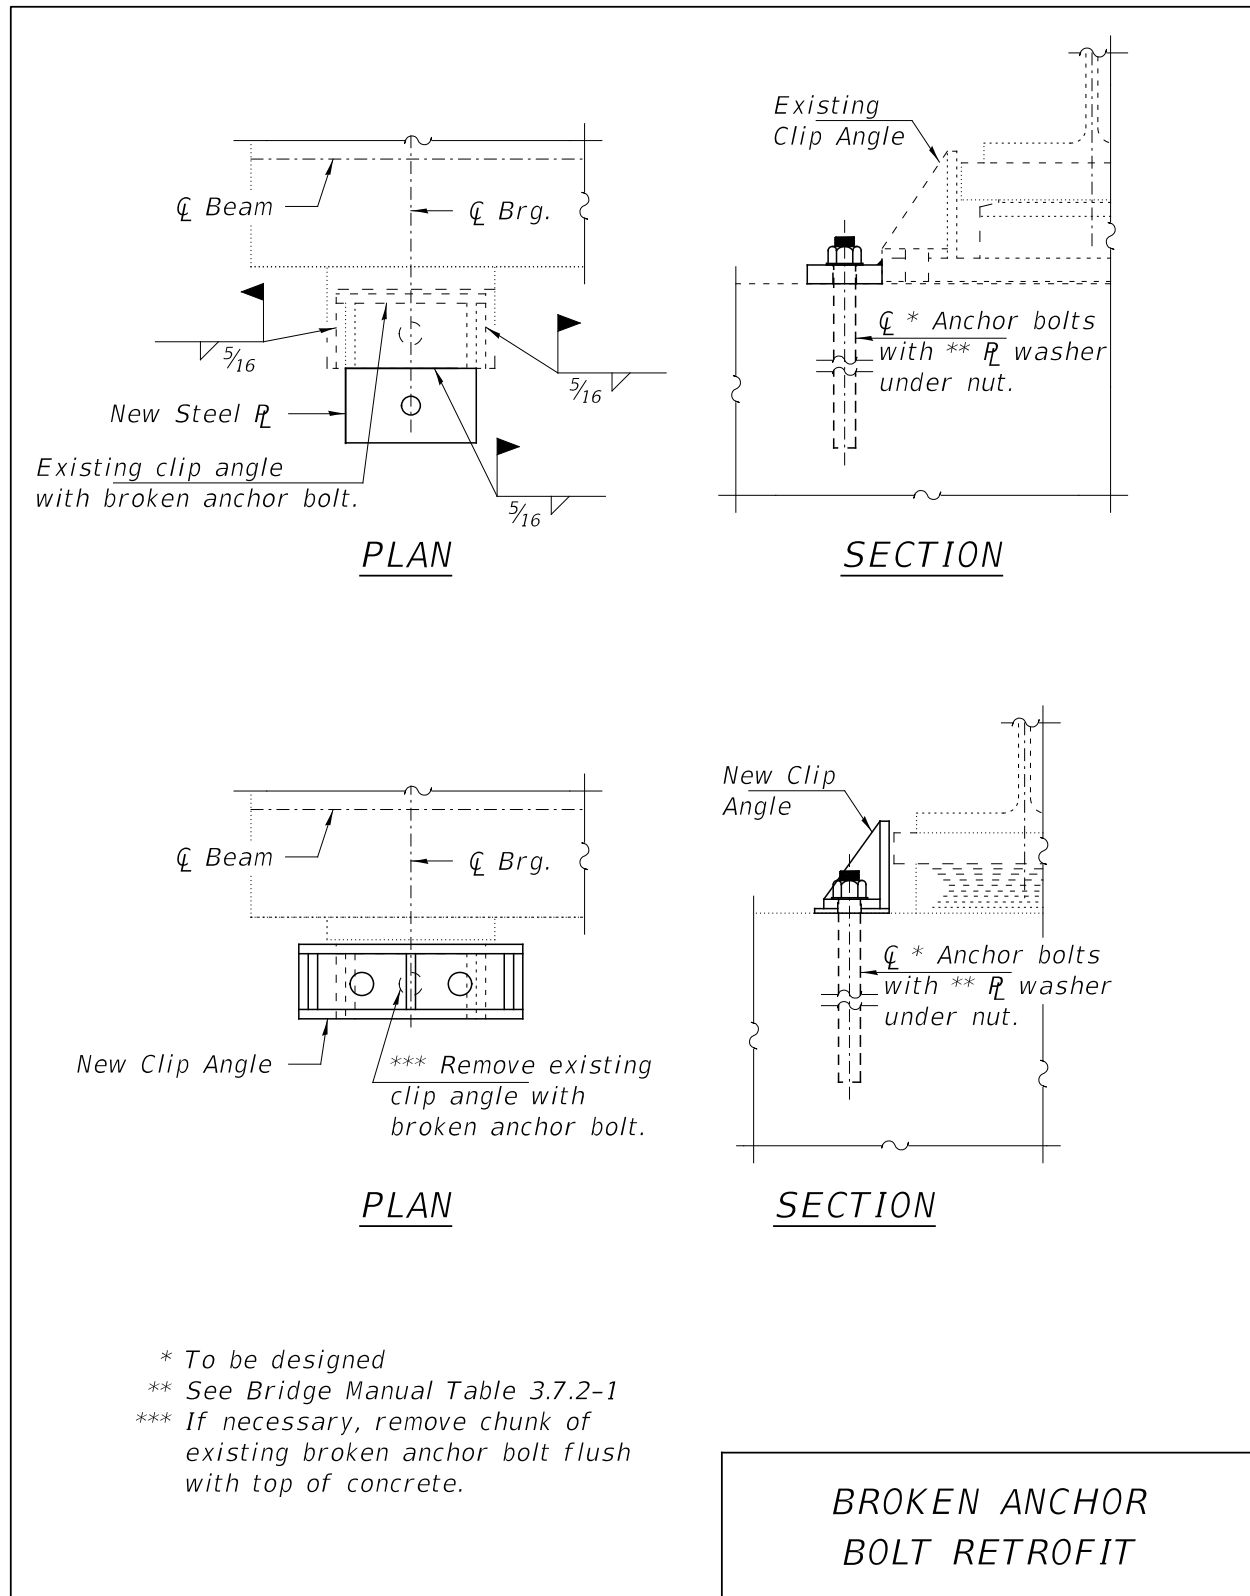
Broken Anchor Bolt Retrofit
